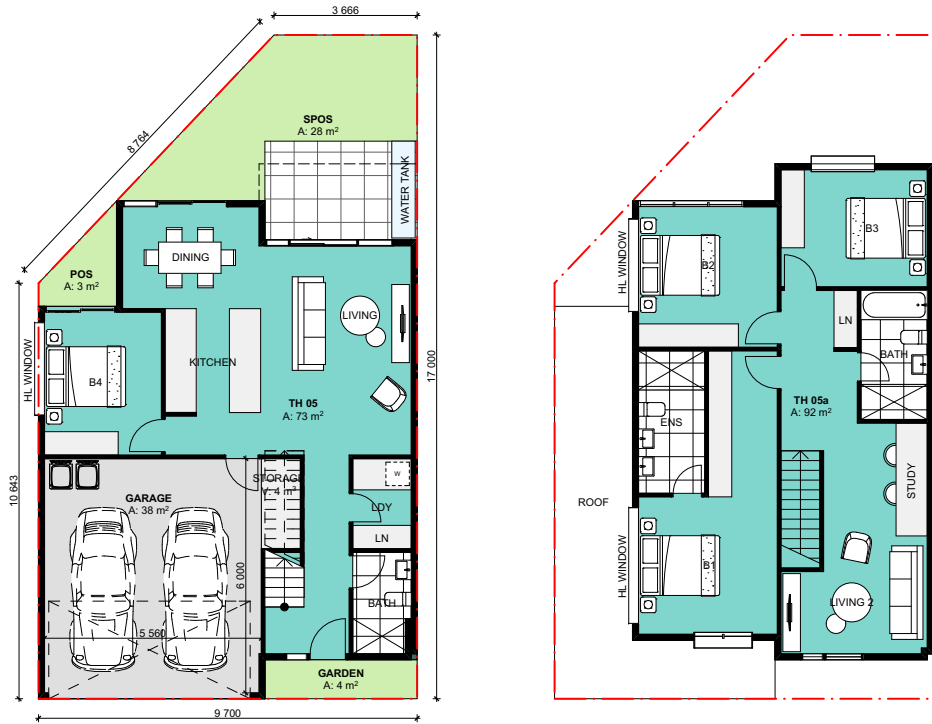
Townhouse Type 05 (Source: Plus Architecture)
